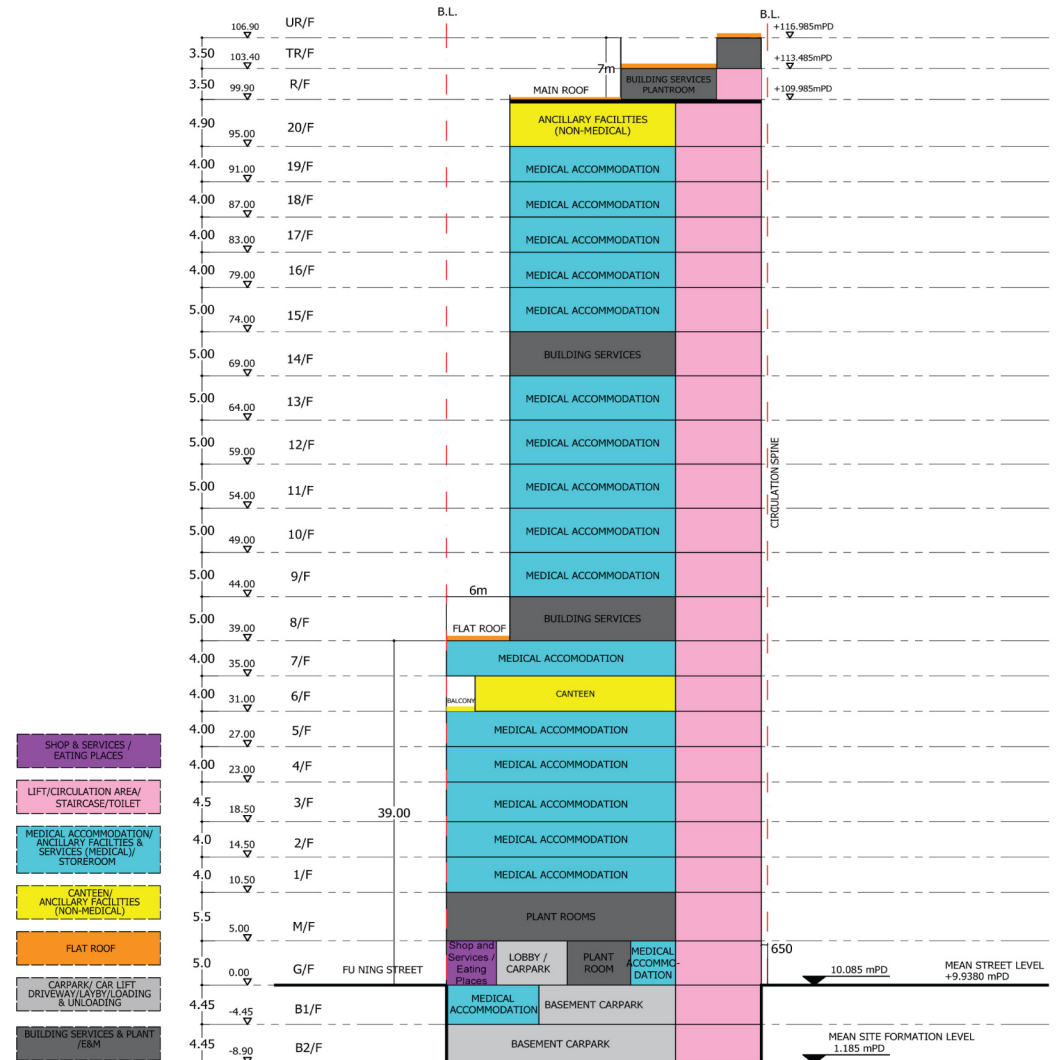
SECTION PLAN OF APPROVED S12A SCHEME AND IDS
